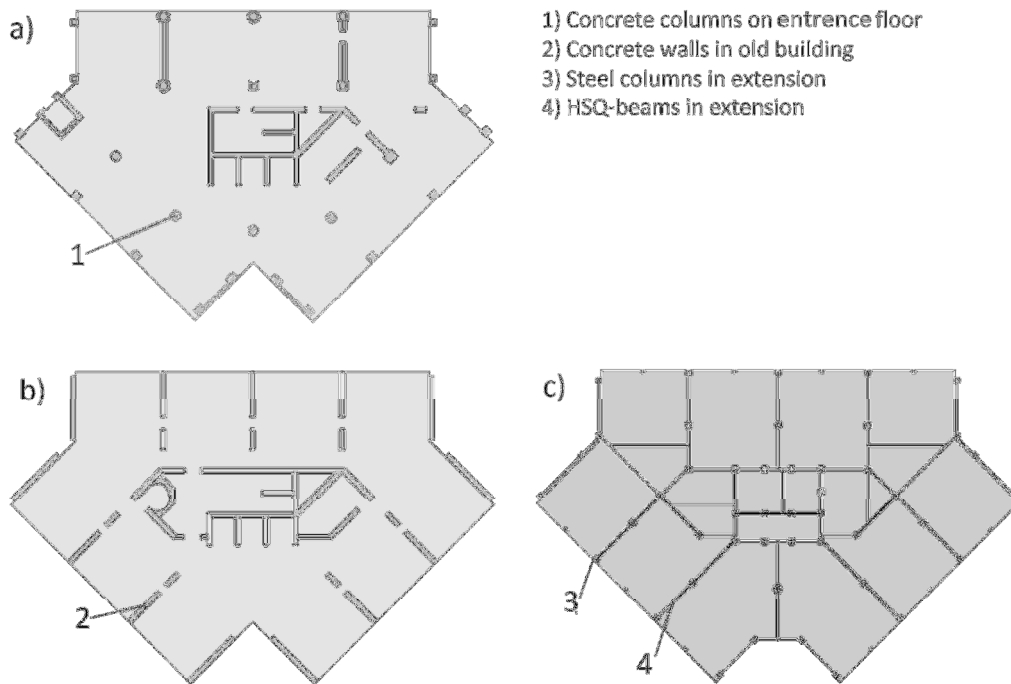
, Simplified illustration of plans in Gothia Central Tower; a) entrance floor, b) upper storey in old building, c) storey in the extension.
